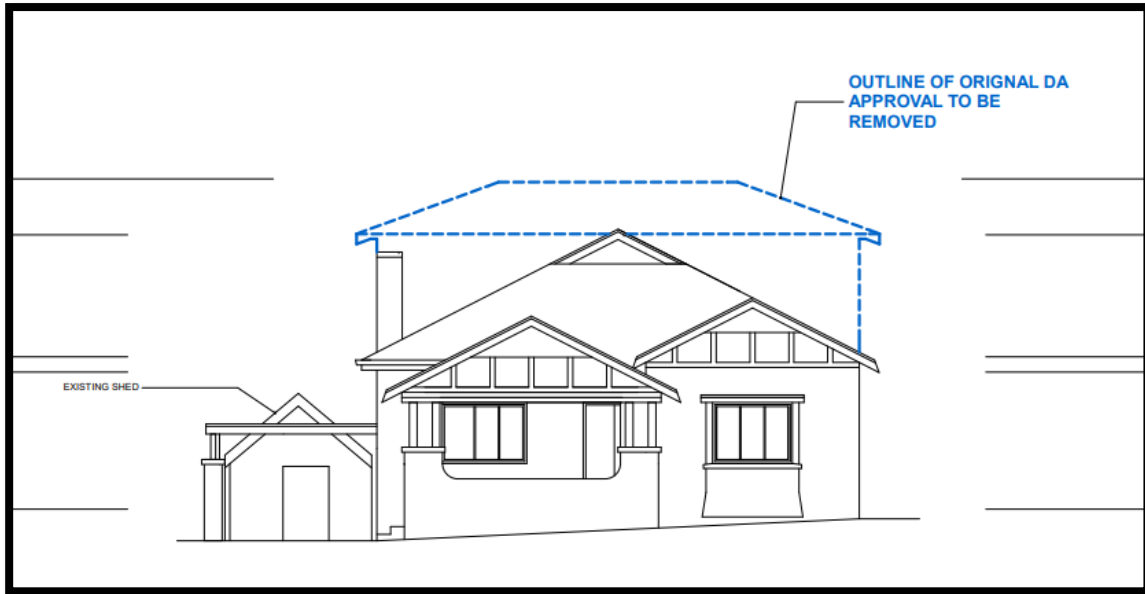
(DA 2018.124.3) - Proposed Modification to the North Elevation
